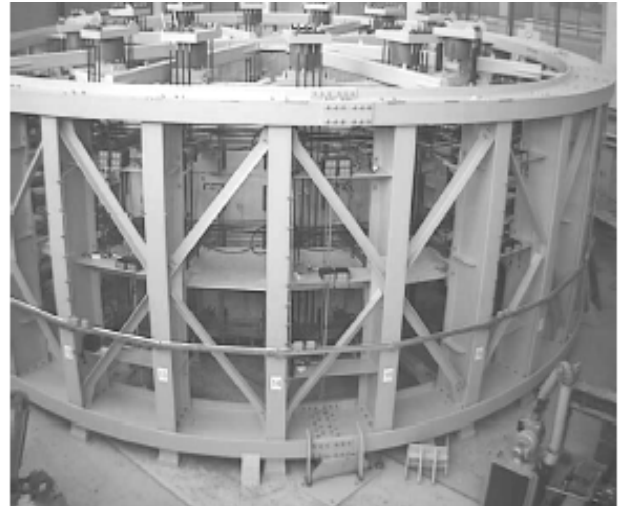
Full-ring test of the lining structure of Holland's “Green Heart” tunnel.
